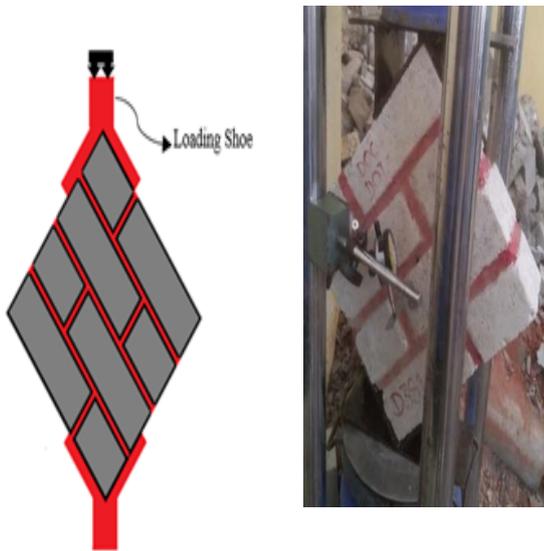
Diagonal test assemblage of (a) schematic and (b) testing arrangement.
